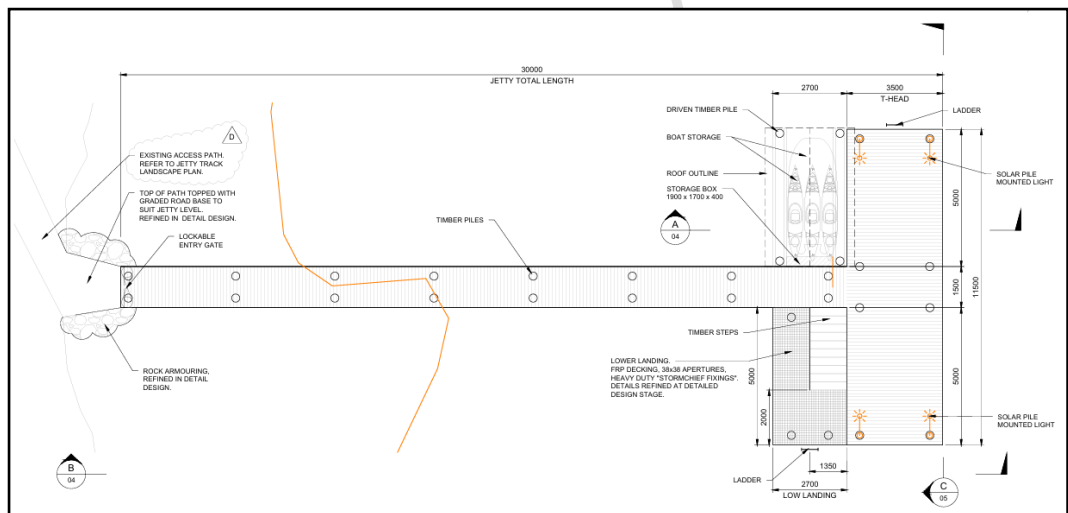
Plan of the proposed jetty, t-head and boat shed (Burbury).
